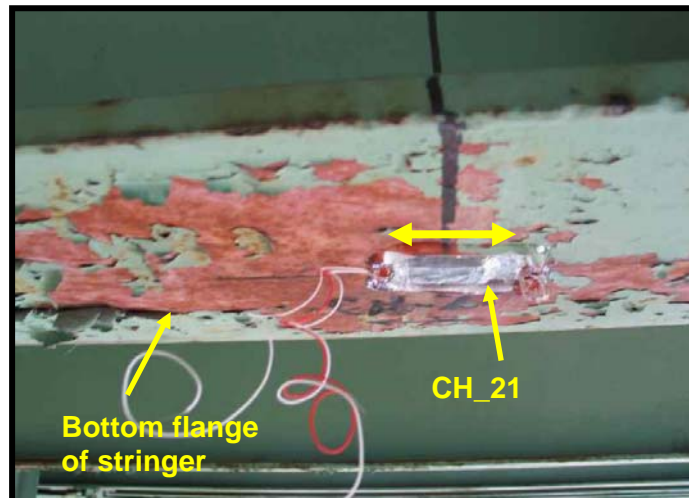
CH_21 installed on the bottom flange of stringer the stringer located 25 feet east of the floorbeam to the truss hanger connection
